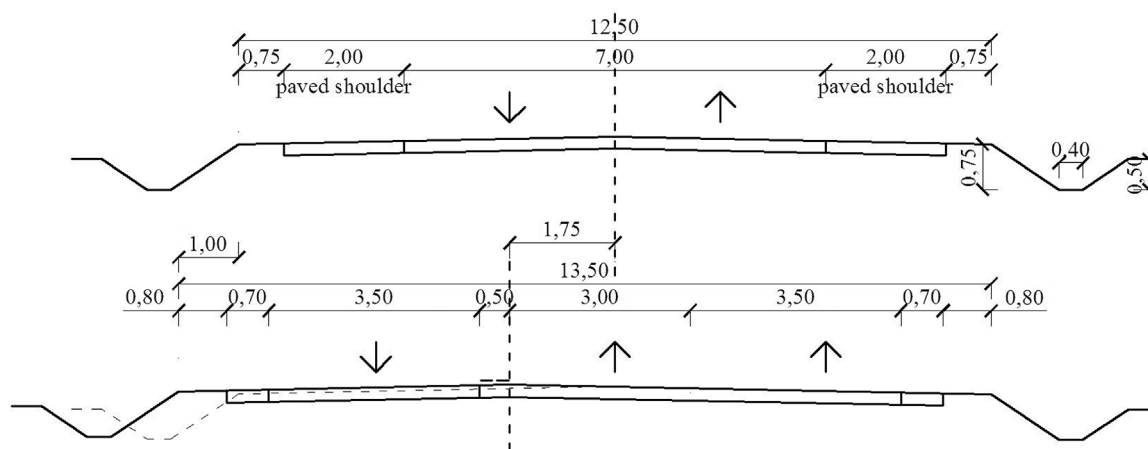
Converting a two-lane road with wide paved shoulders into 2 + 1 cross-section.
